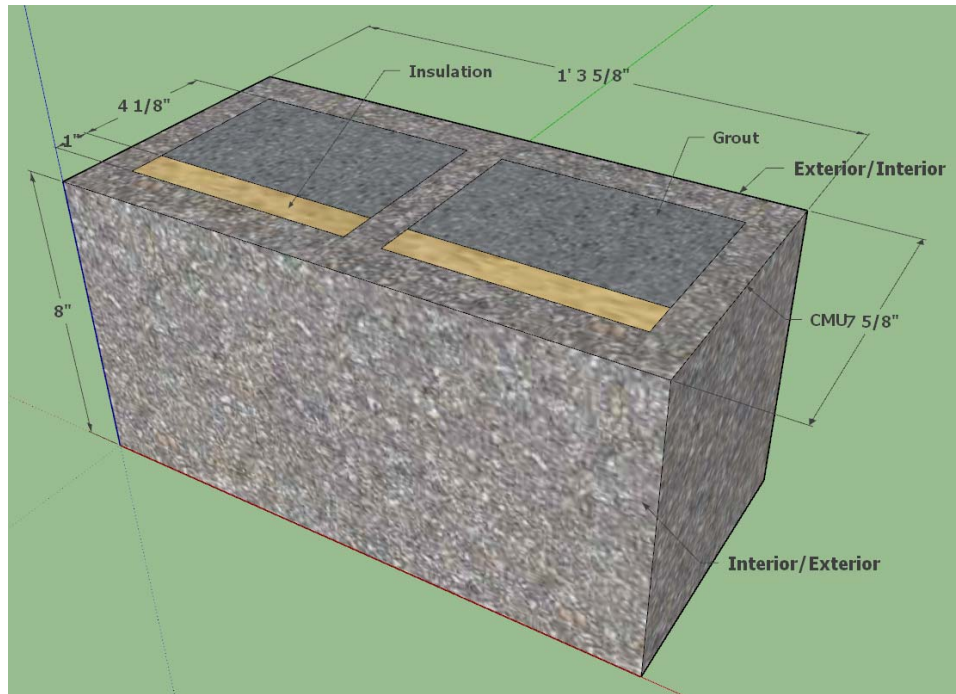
Grouted CMU Wall with Rigid Insulation Insert
